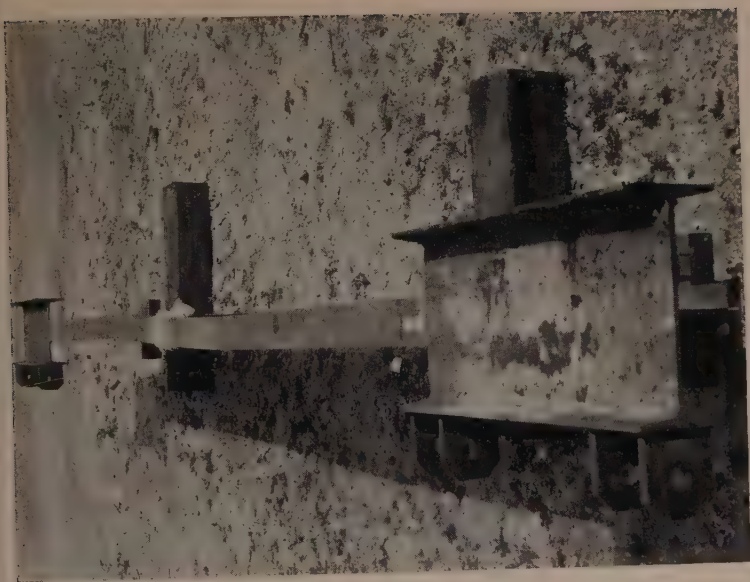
GIRDER No. 1 AFTER FAILURE UNDER 19.1 TONS AT EACH LOAD POINT
